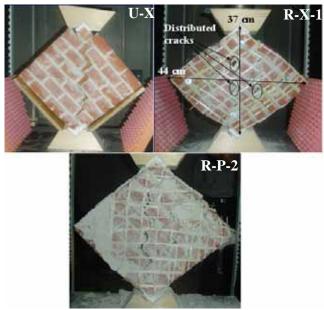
Failure patterns of brick masonry wallettes without and with retrofitting by PP-band mesh.
